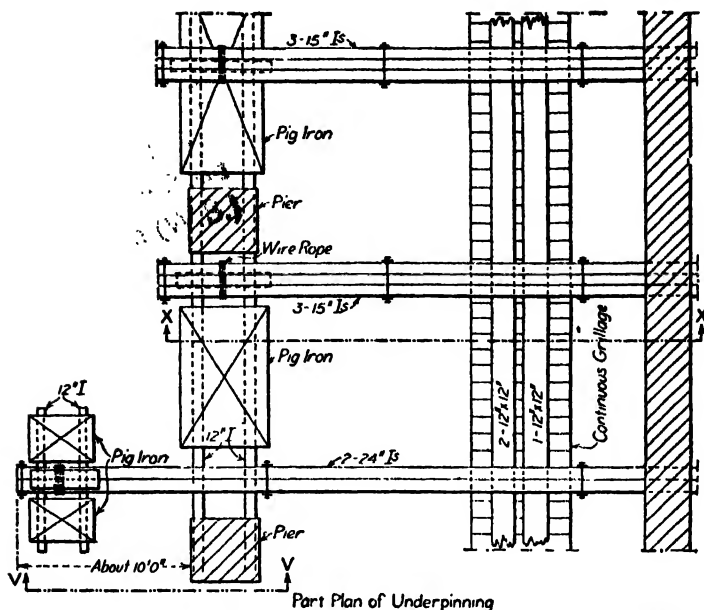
Arrangement of Underpinning, 92-94 Maiden Lane, New York City.
